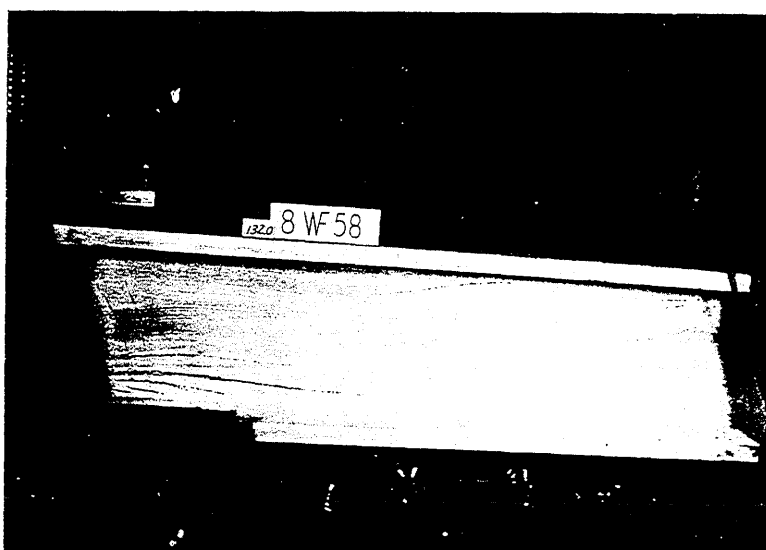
BEAM B1 - V-M SECTION - LOAD = 132 KIPS
